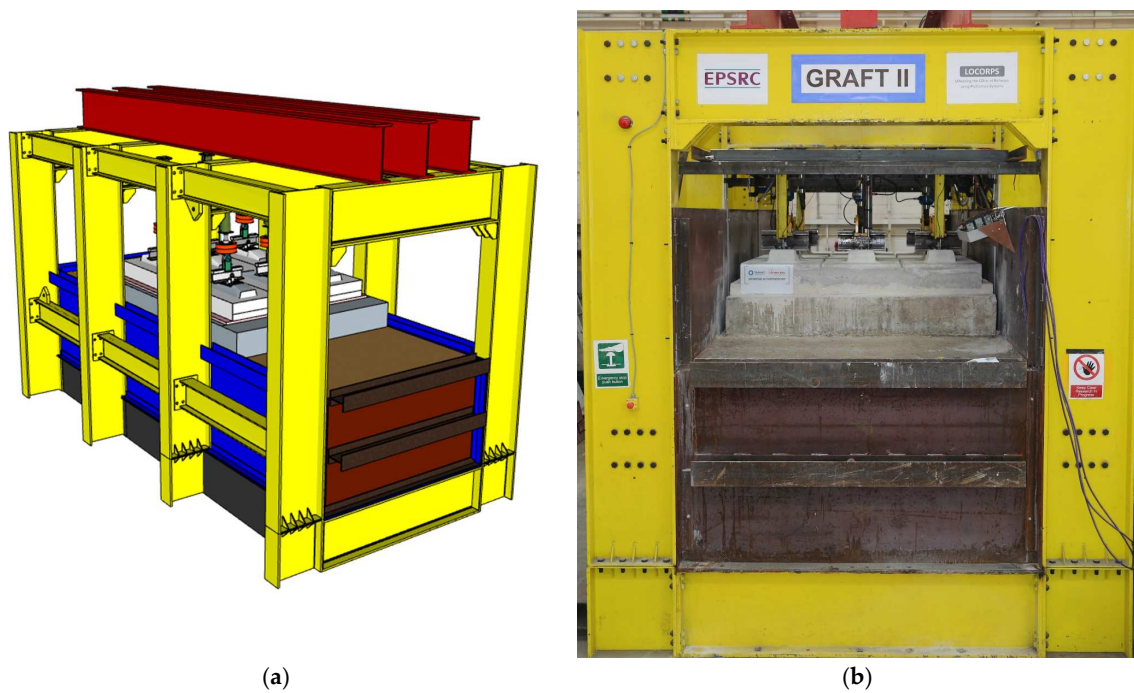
Slab track resting on the conventional embankment in the Geopavement and Railways Accelerated Testing Facility (GRAFT-II). (a) A 3D sketch of the facility and (b) a photo of the facility from the side view.
